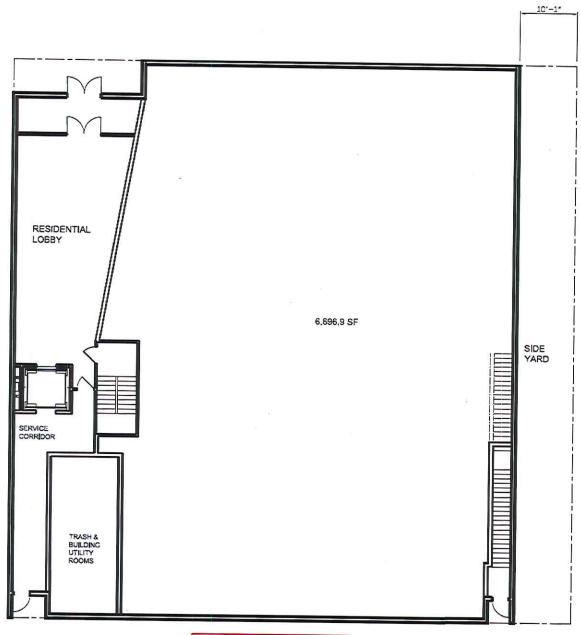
912-920 KING TYPICAL FLOOR PLAN
